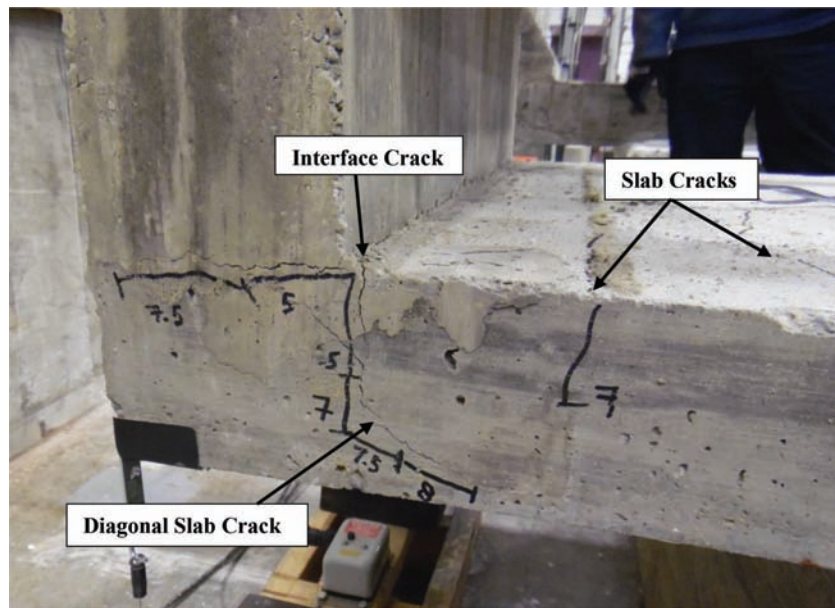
Strip Specimen 6 cracking at 8 kip.
